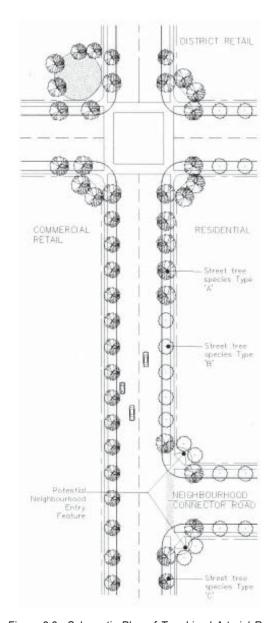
Schematic Plan of Tree-Lined Arterial Road
